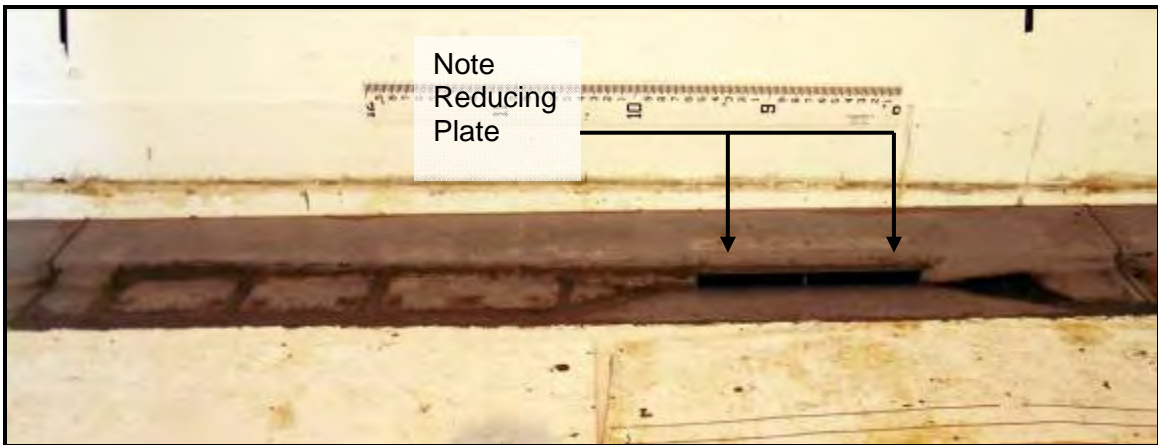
R5 with 4-in. Curb Opening Photograph
